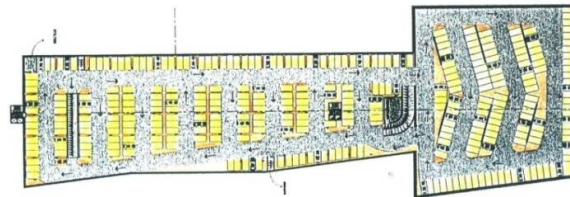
Basement floor plan (-3) and (-4) of First Underground Garage under Tahrir Square.
